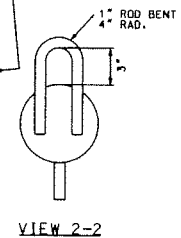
DETAIL F - CLIMBING AND WORKING LADDER CLIPS
